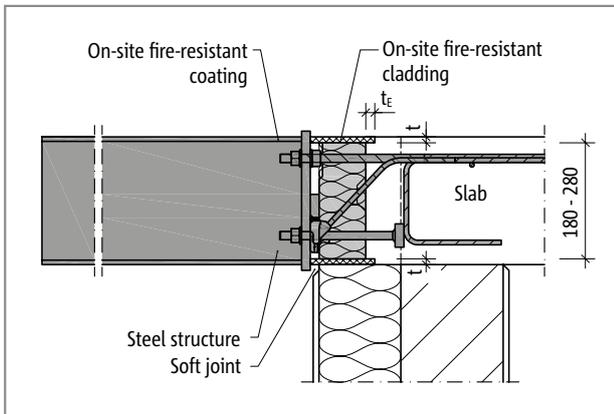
Schöck Isokorb® T type SK: on site fire-resistant cladding of the connection when using steel structures with fire-resistant coating; cross-section
